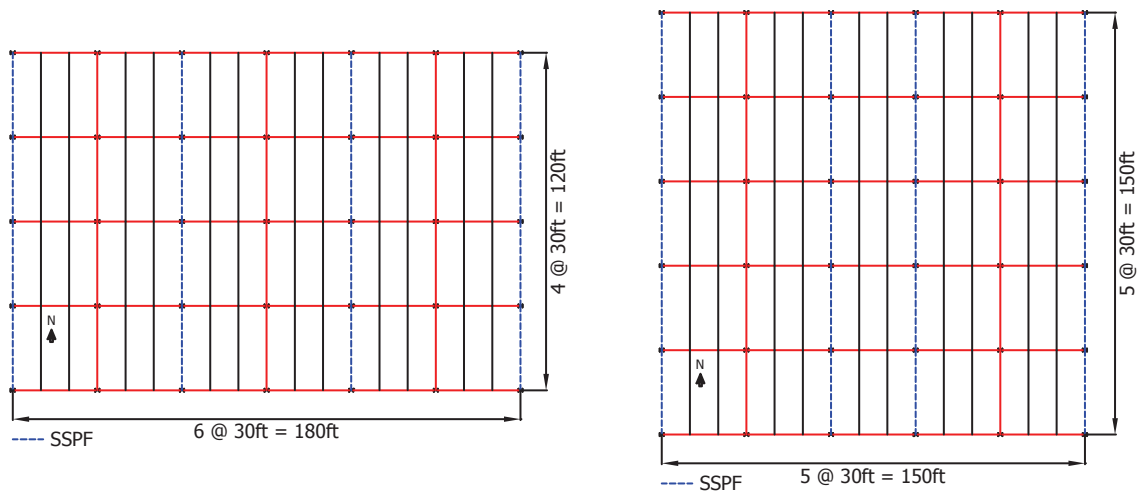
Plan view of the three-story prototype building (left) and ten-story prototype building (right).
